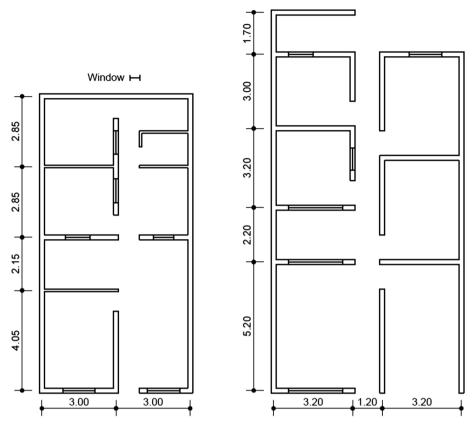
Examples of plan views of the surveyed unreinforced masonry buildings
